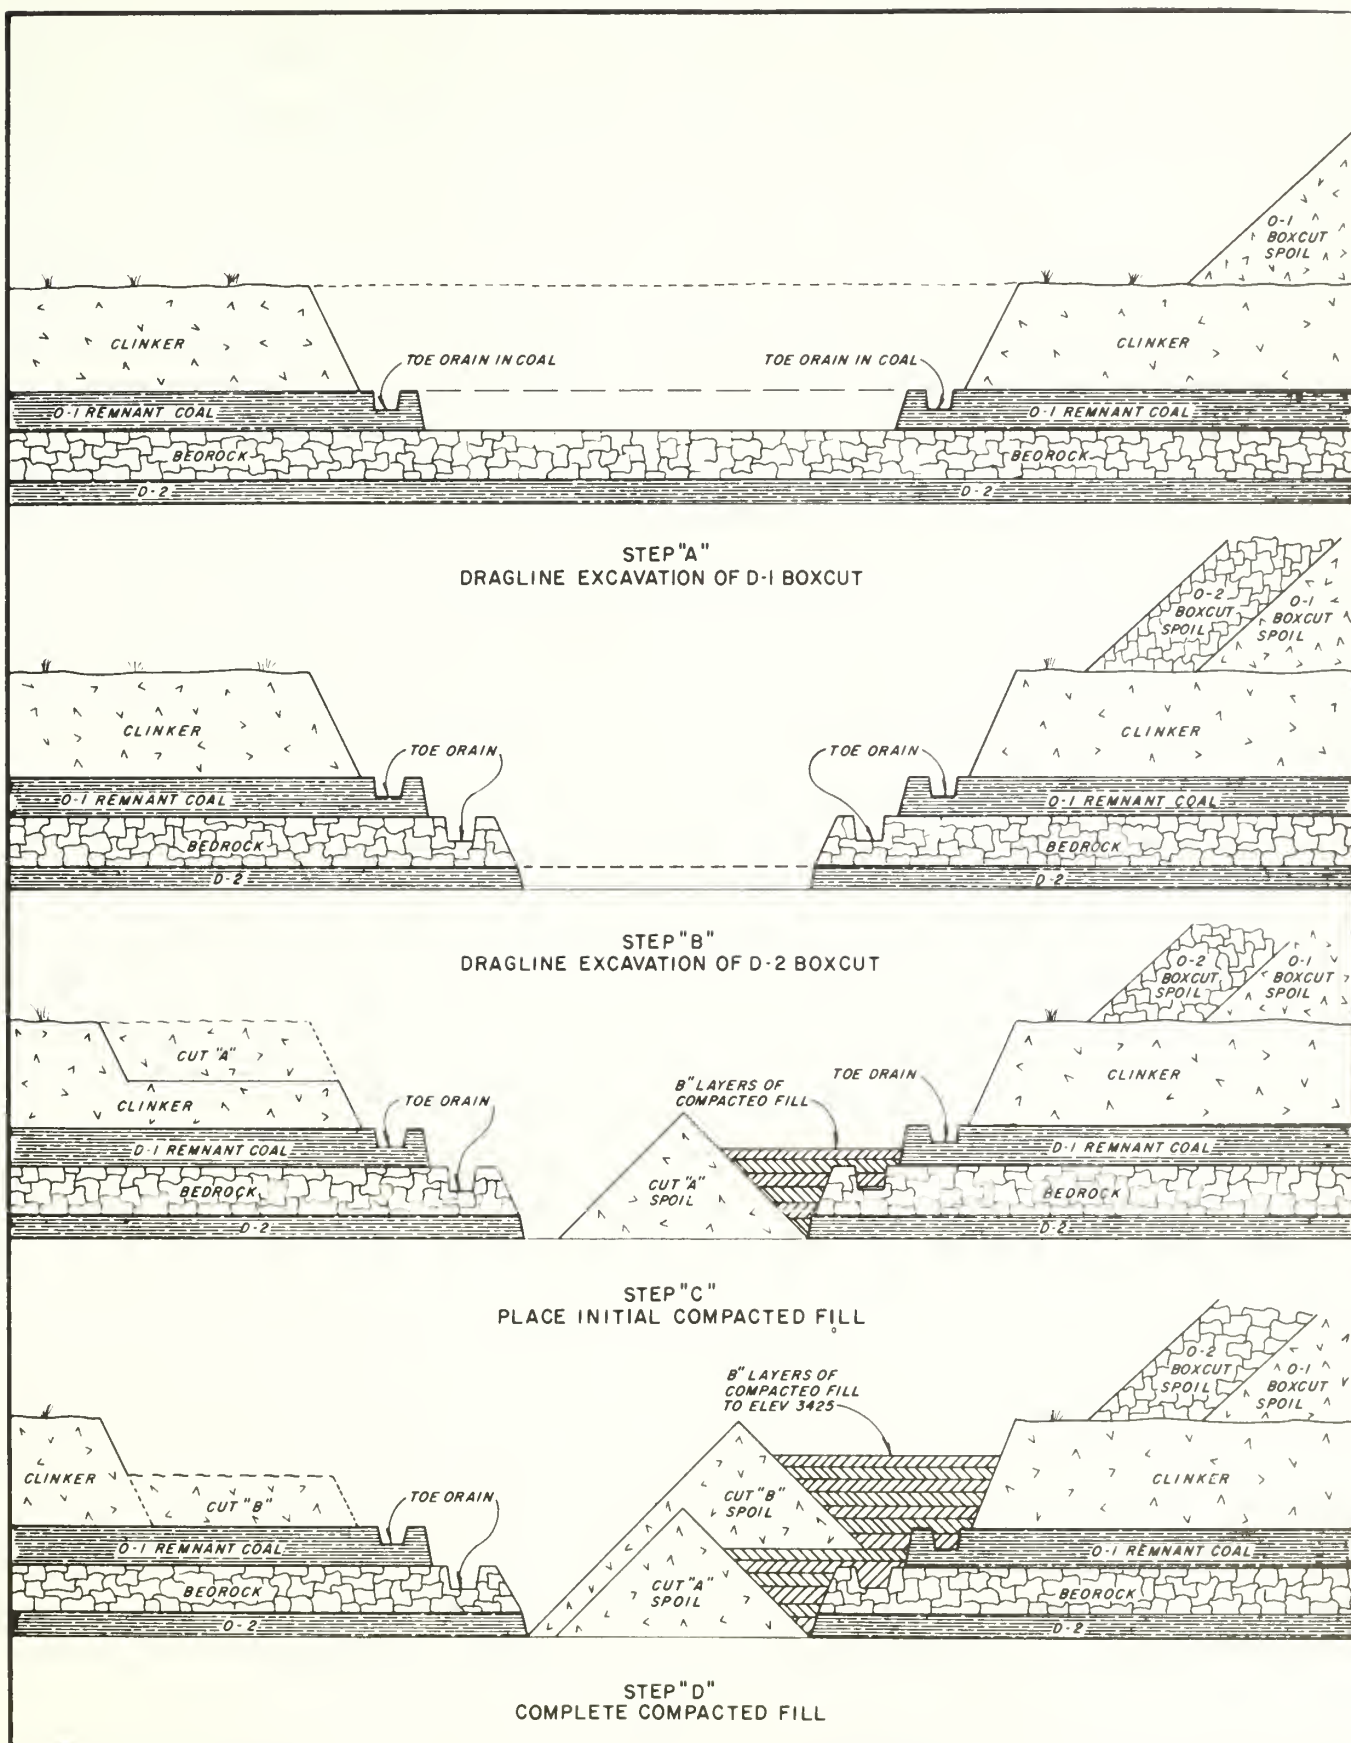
Diagrammatic cross section showing details of construction of ground-water barriers in the North Extension area.
